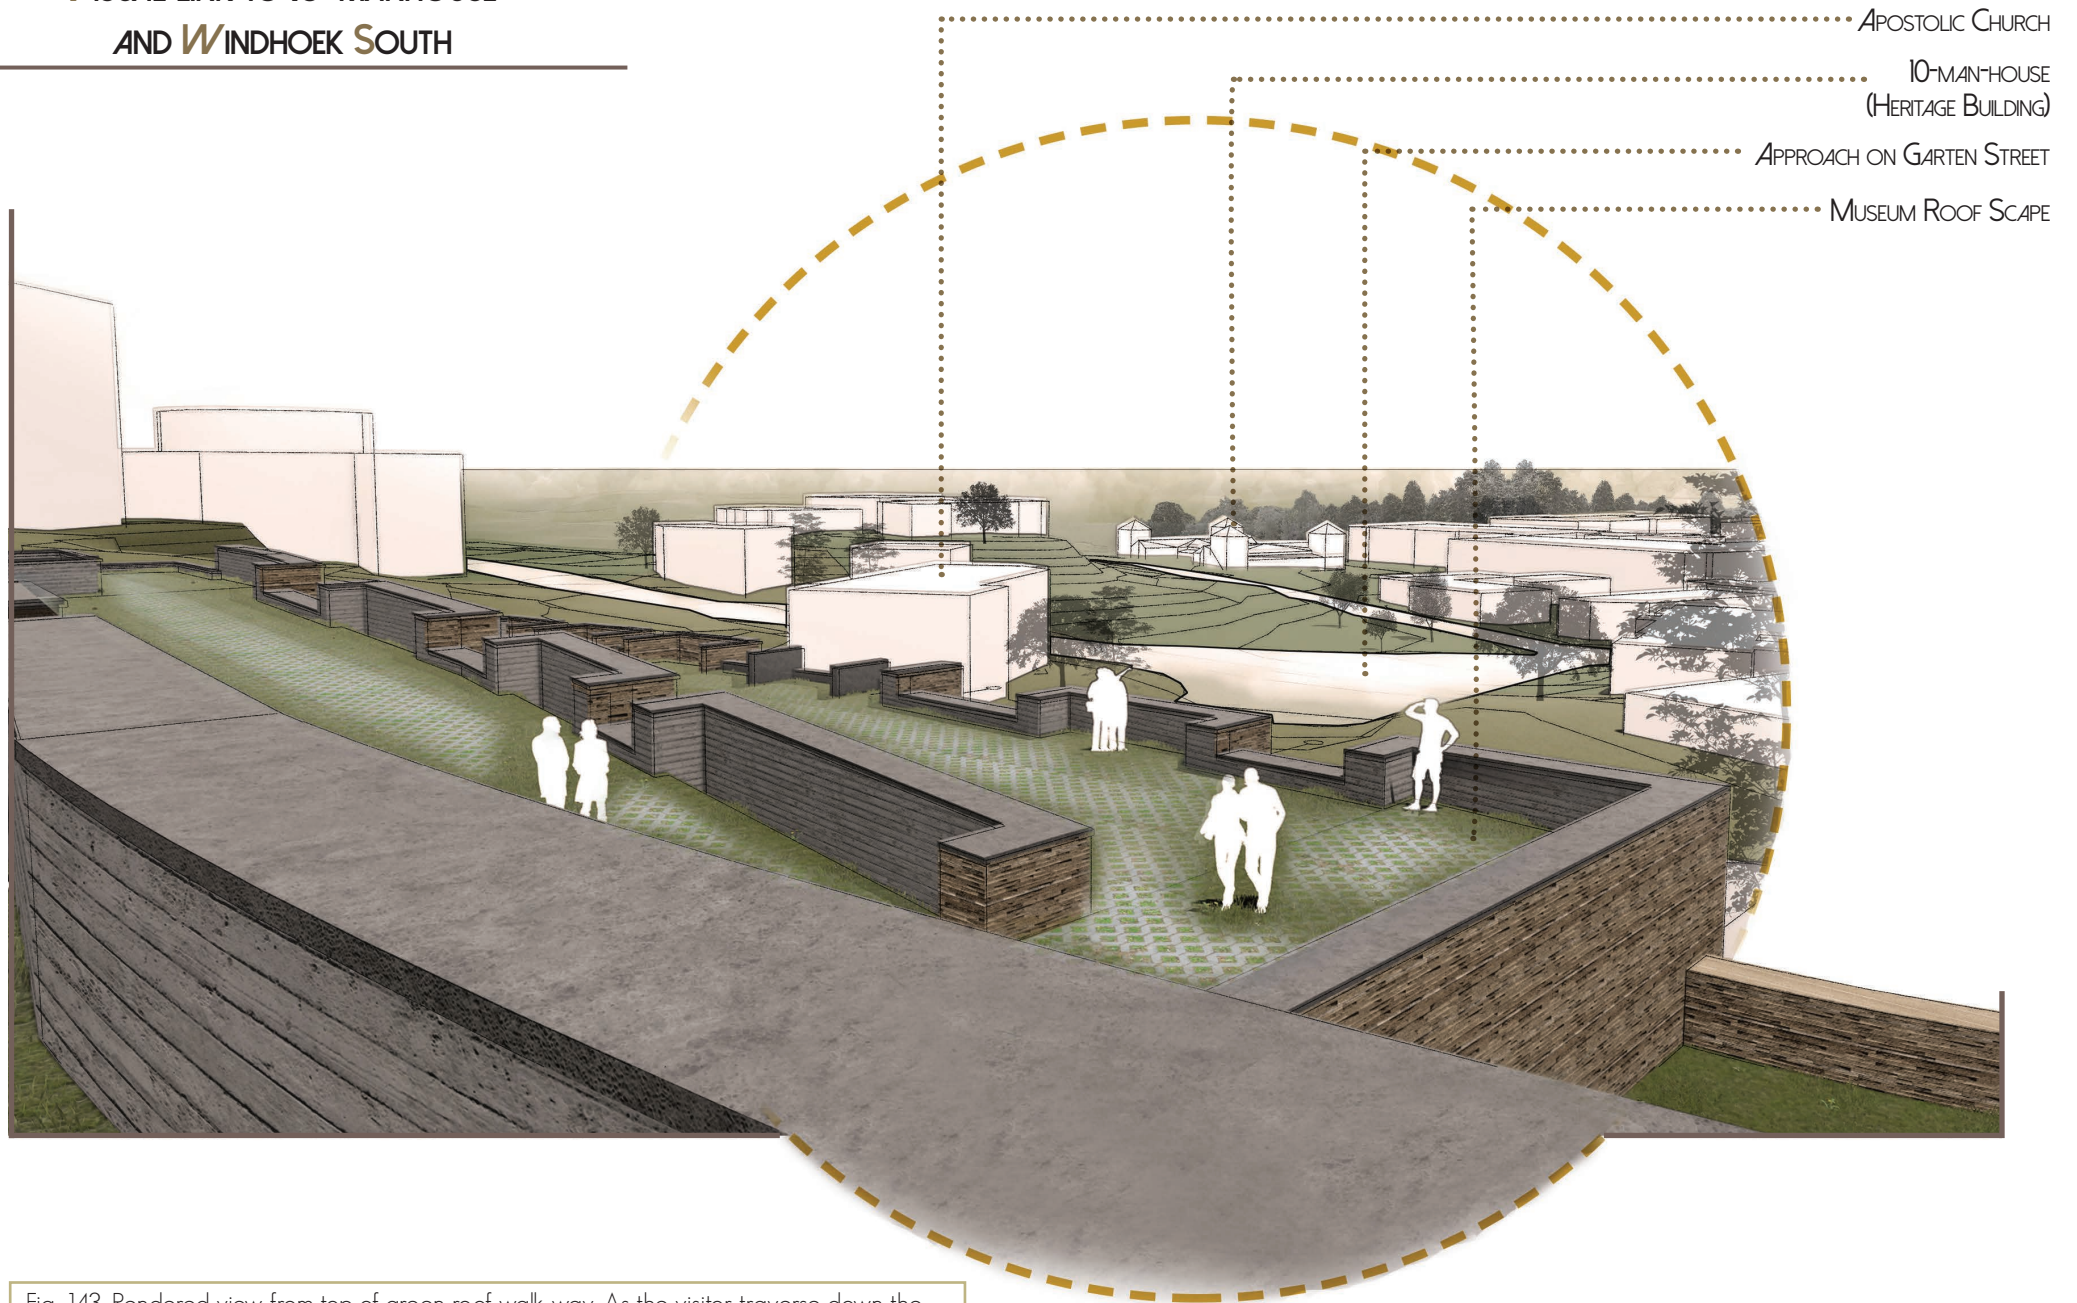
Rendered view from top of green roof walk-way. As the visitor traverse down the building rooftop their perspective changes framing the city. (Rendered Viewpoint 4)
